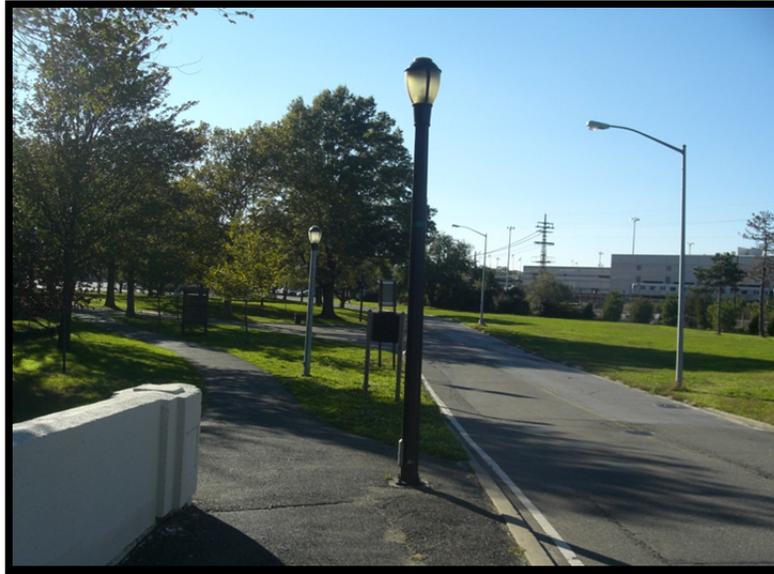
General Condition of the Bridge deck and sidewalk
